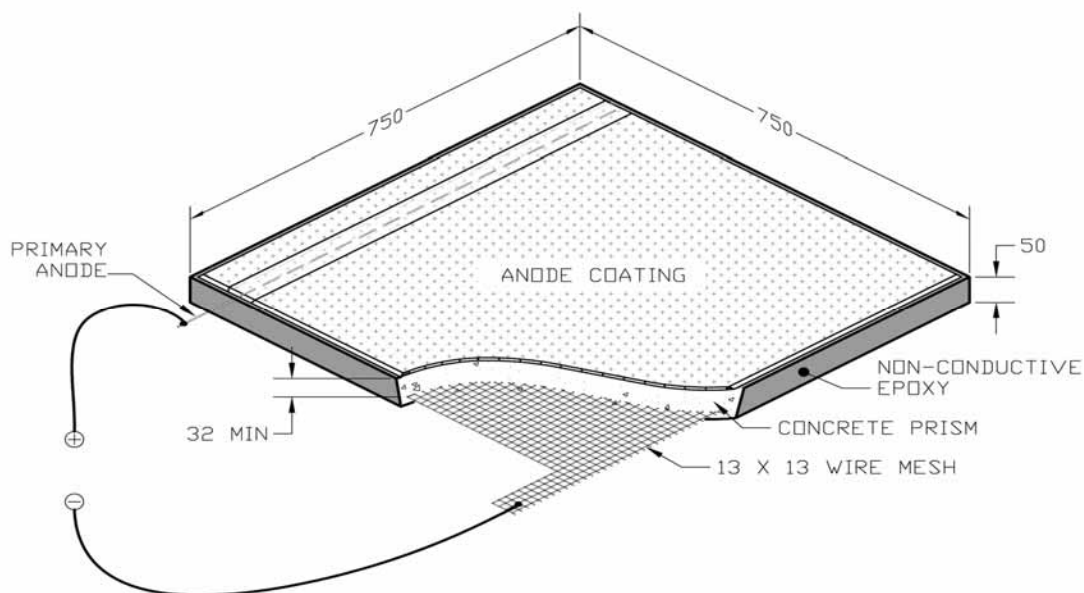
Panel Construction with Bottom Side (Form Side) Up
